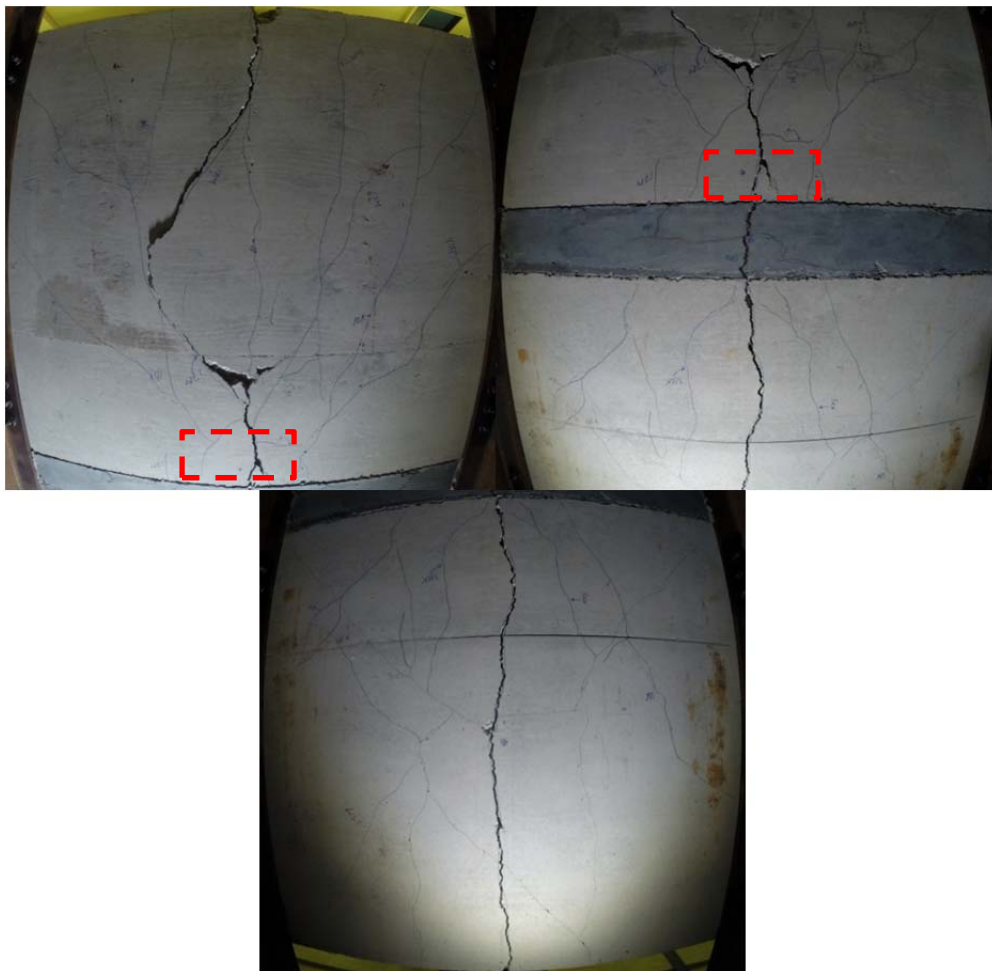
RB-1: Underside of slab after failure loading. (Top left: slab loaded adjacent to panel, Top Right: closure strip, Bottom: panel loaded in centre)
